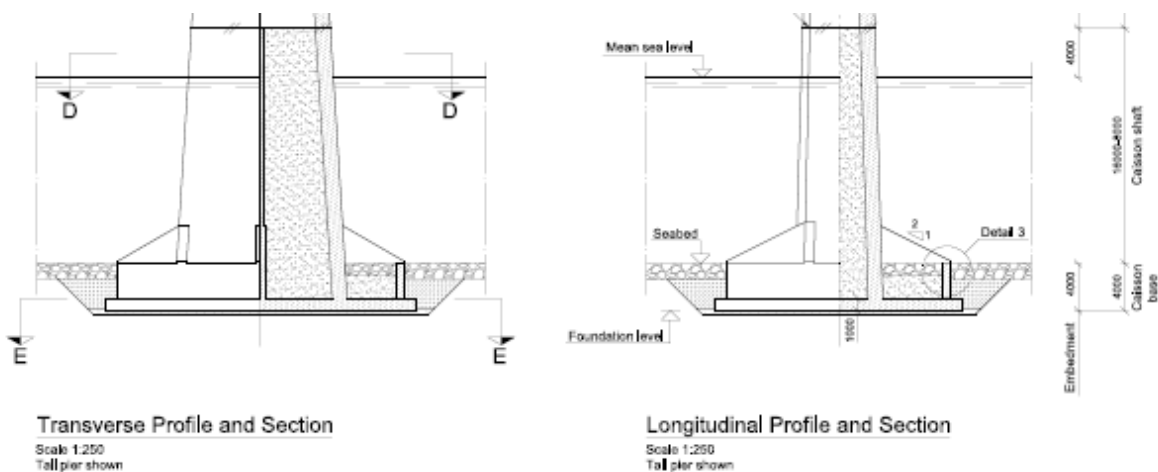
Type IV Pier (technical drawing A4429-C-P-DWG-33-52071)
